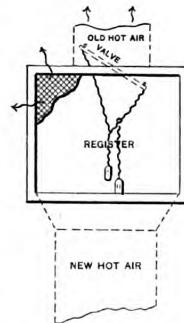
First-Floor Register and Damper in Flue to Upper Floors.
